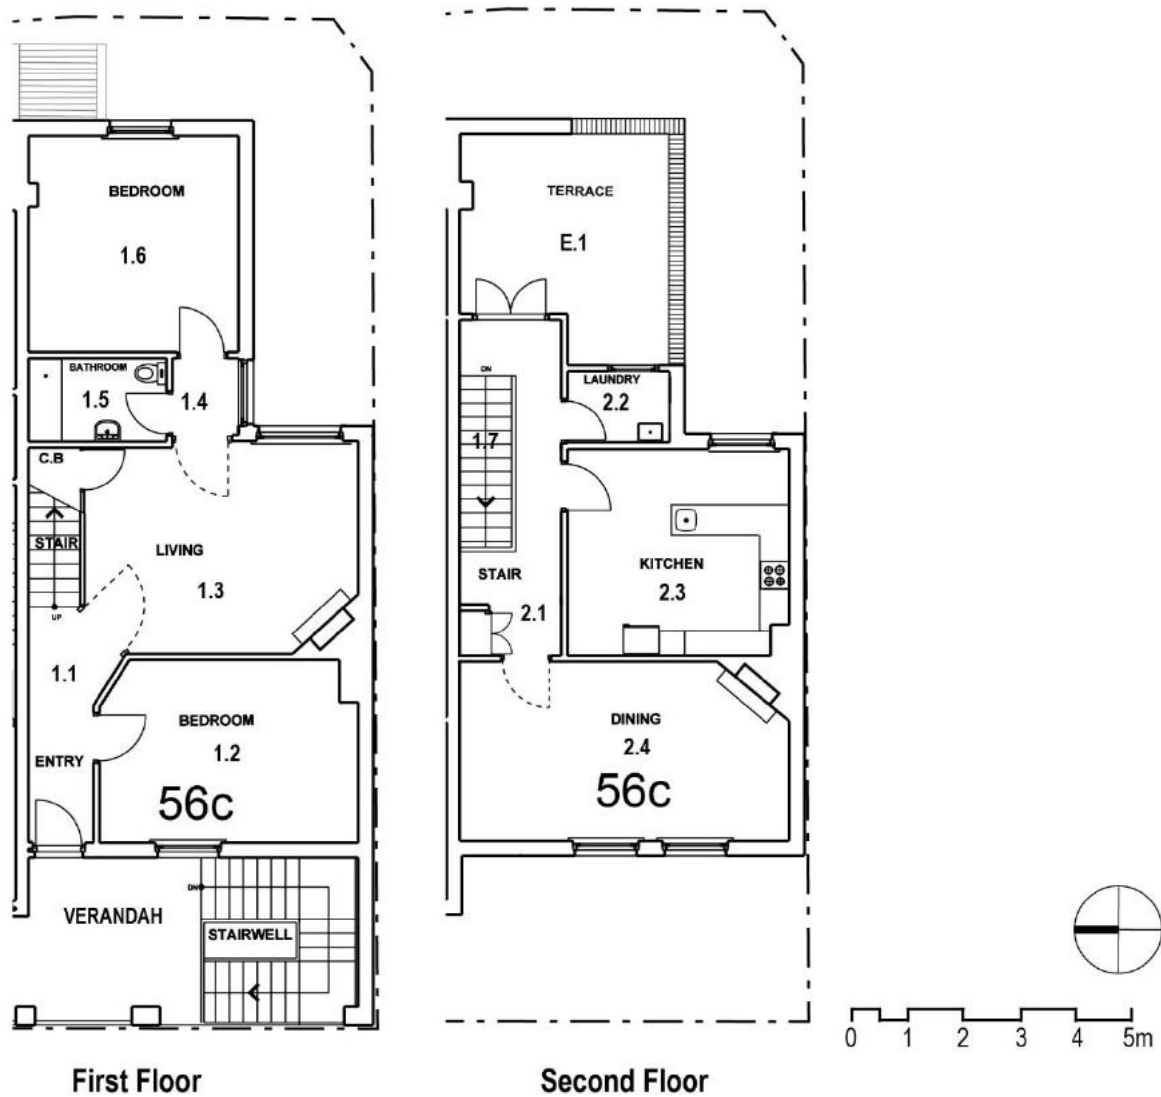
Floor Plans of Flat 56C / 46–56 Gloucester Street showing layout of flat and space numbers, for the first and second floors. (Source: LAHC, with GML overlay 2016)
